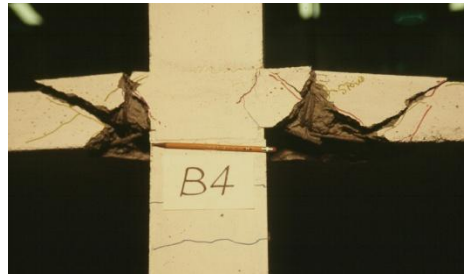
Punching failure for RC connection without shear reinforcement with significant drop in floor slab – major repair required [Hwang and Moehle, 1989]
